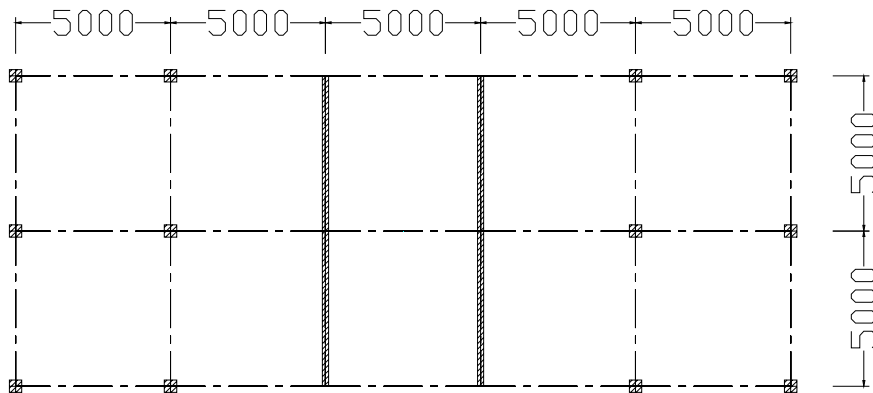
Shear walls are placed at 2.5 m far from the centre of mass of the building in the short direction on both sides.
